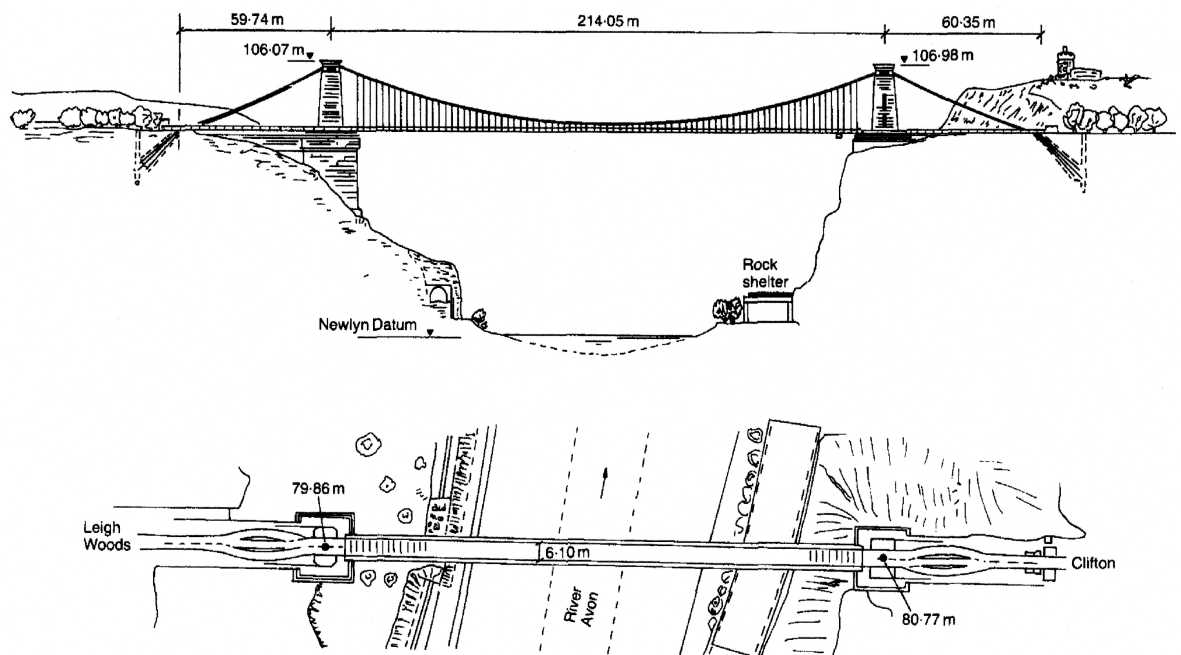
Plan and elevation of Clifton Suspension Bridge (Mitchell-Baker 1988)
